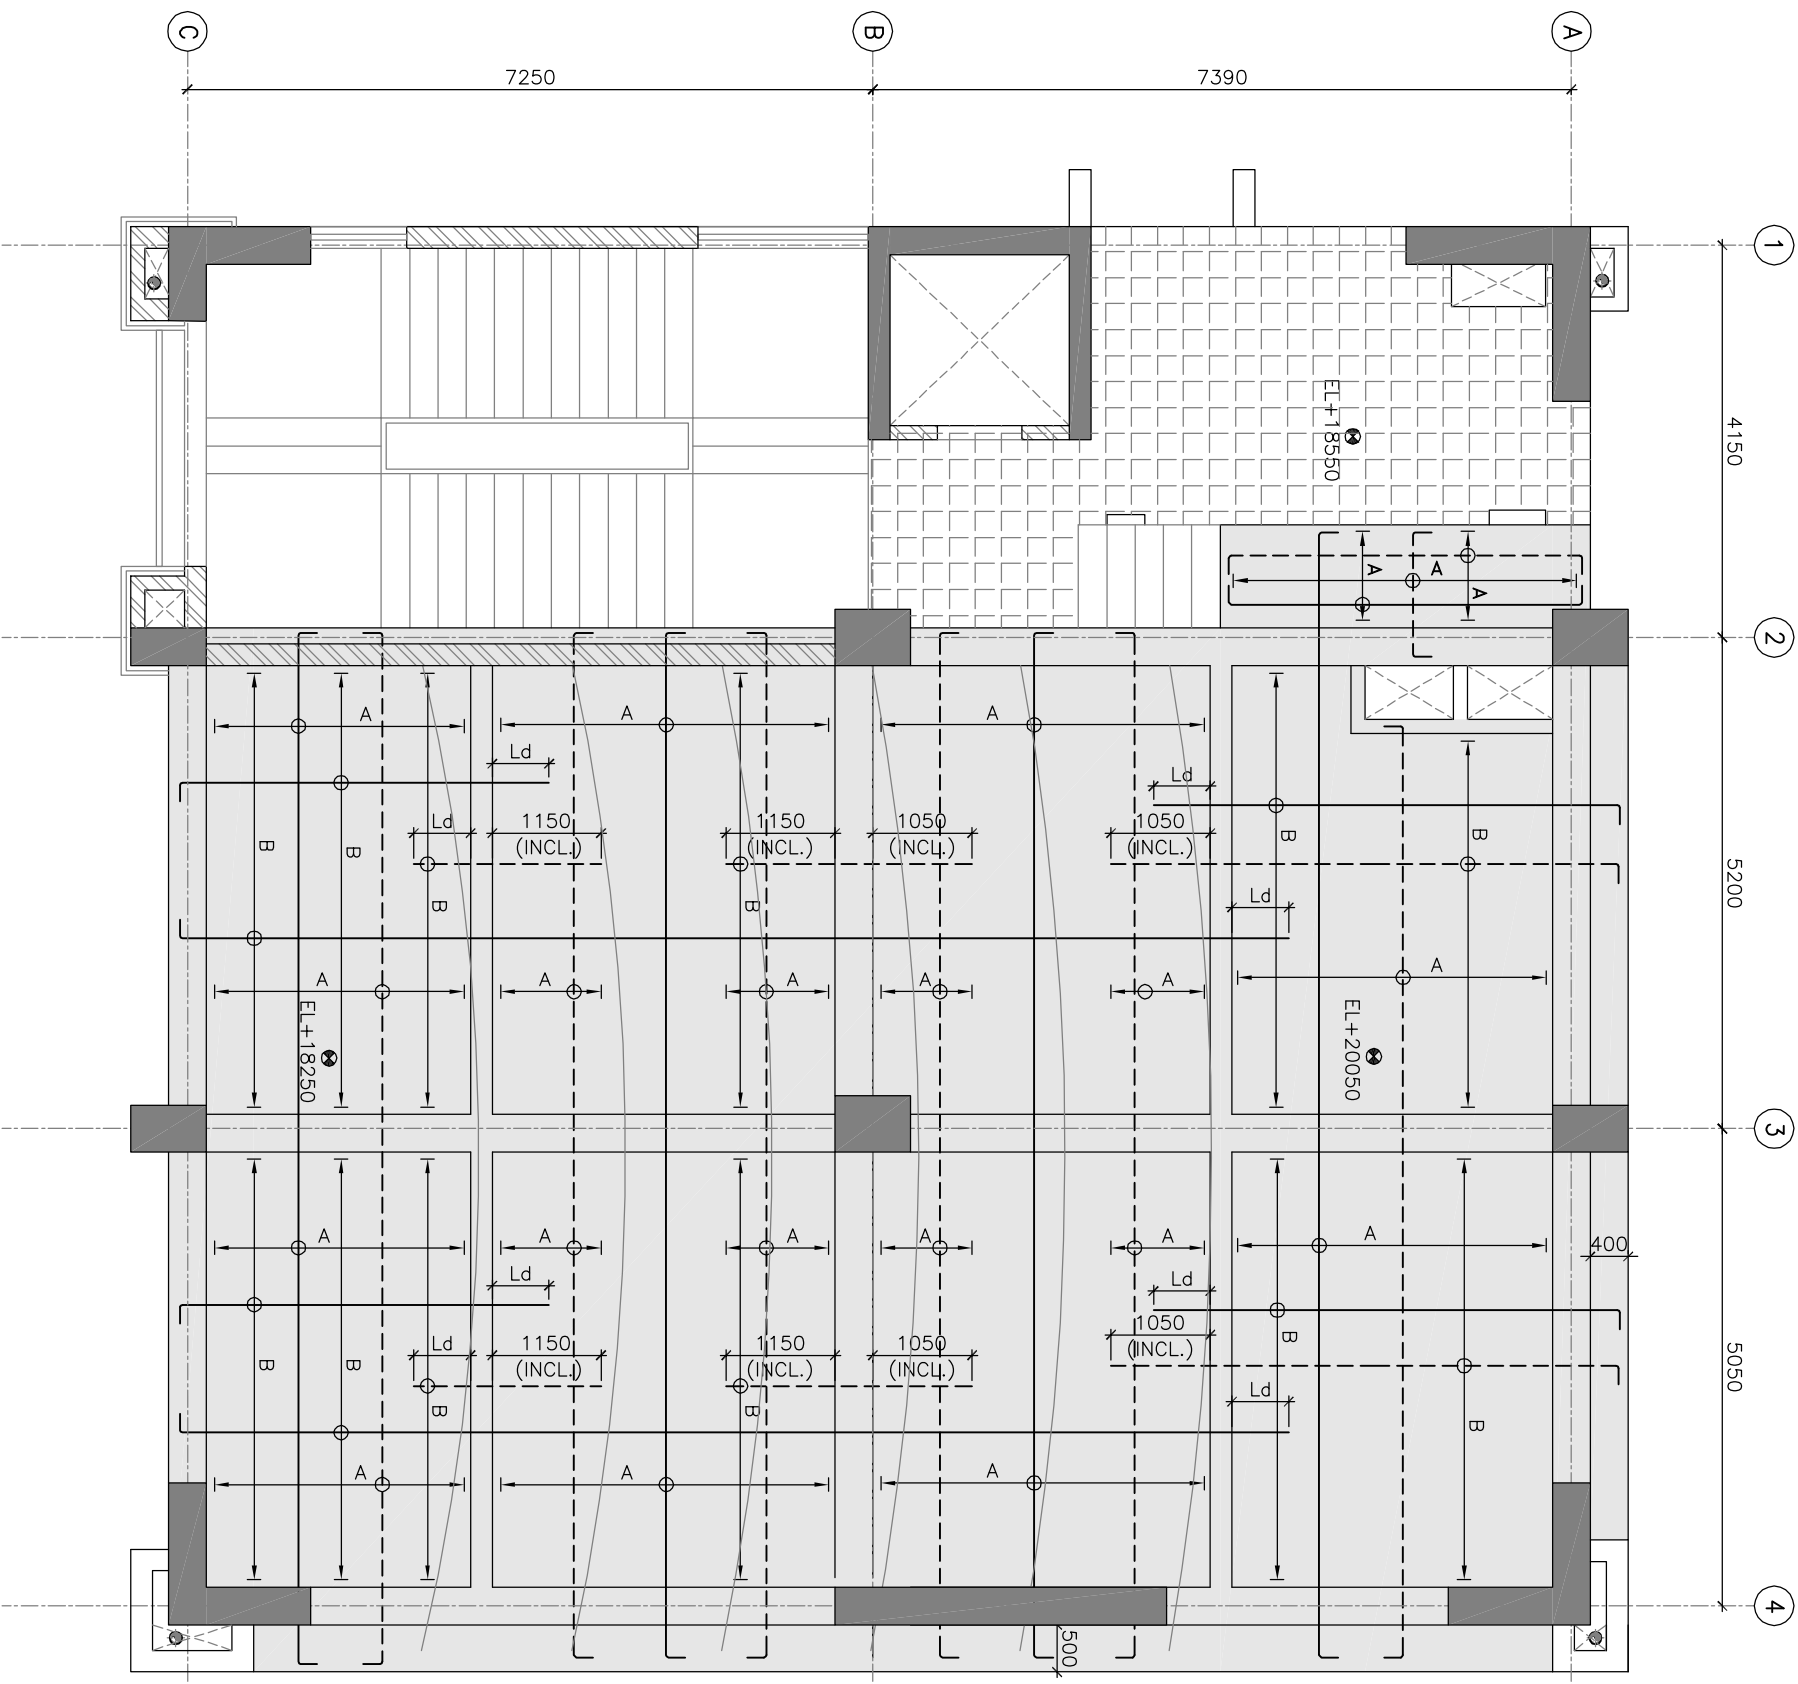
DETAILS OF FOURTH FLOOR SLAB (EL=18550)
